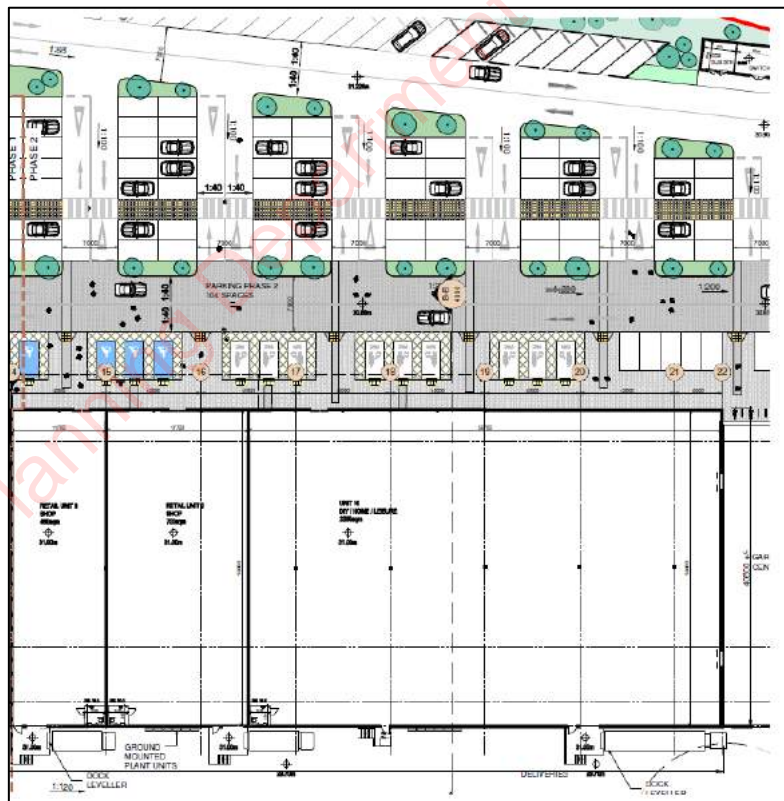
Extract from the ground floor plan showing units 8-10 (Phase 2).
